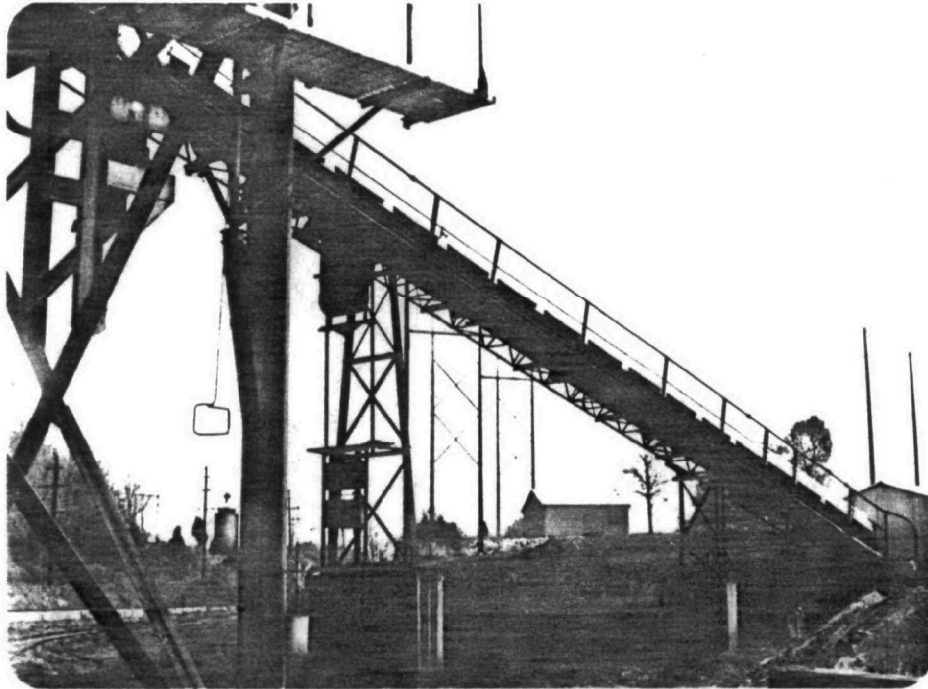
View from ground level facing north showing coal transfer house and conveyors. The coal storage area is in the background.
